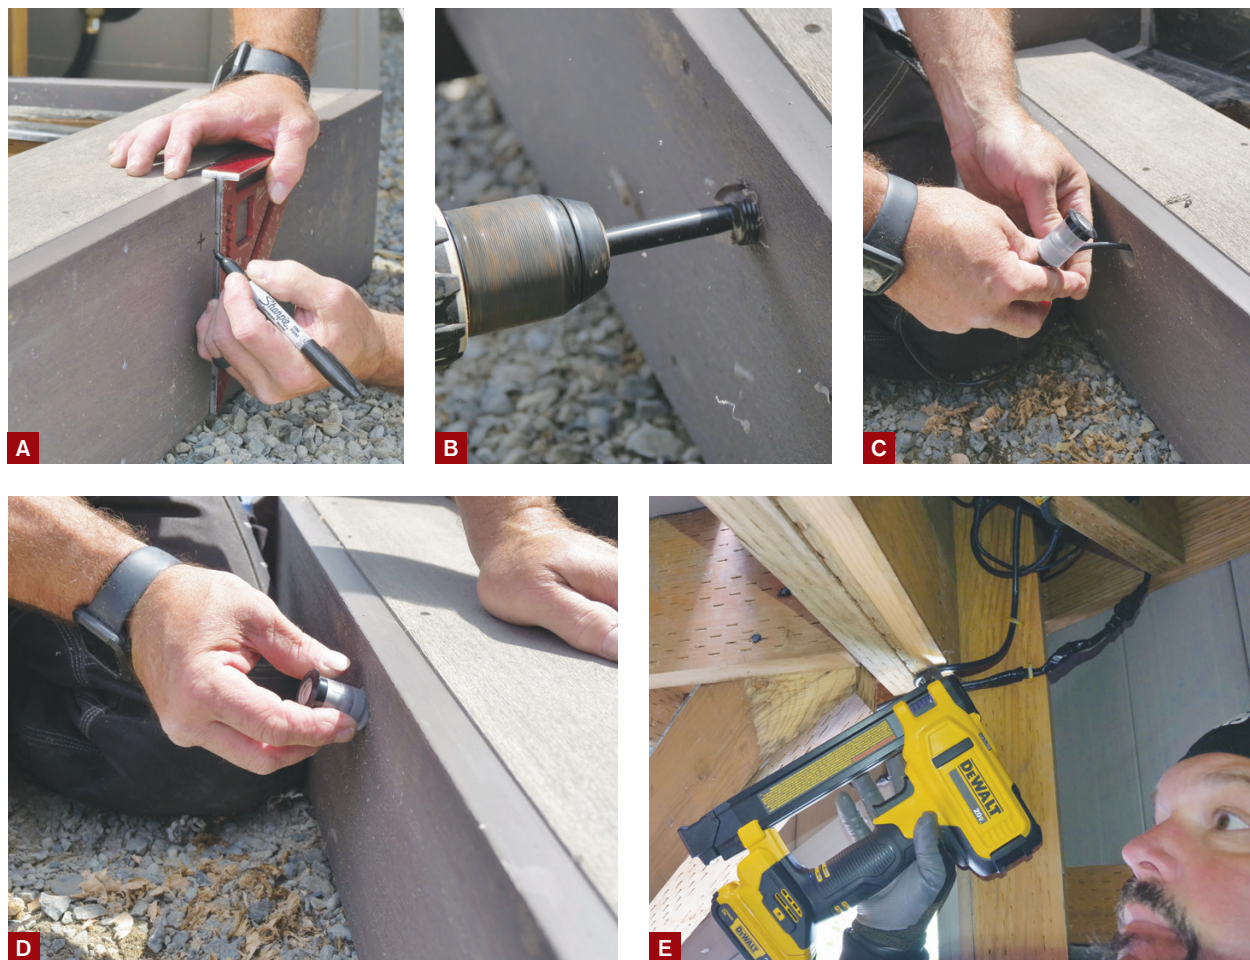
To install a puck light, the author lays out (A) and drills the proper diameter hole with a Forstner bit (B), which creates a clean hole in composite material. After connecting the fixture to supply wiring (C), he installs the fixture; friction holds it in place (D). A cordless stapler makes quick, neat work of running the wiring for the low-voltage system (E).
